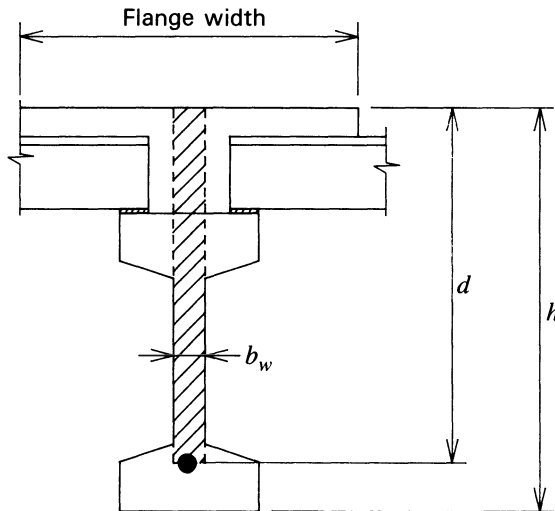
Cross section of a precast prestressed-concrete beam having a composite cast-in-place slab and closure between the ends of double-tee slabs supported by the top flange. The cross-hatched area equals $b_w d$ for eq. 6-5 (ACI 318 eq. 11-13).
